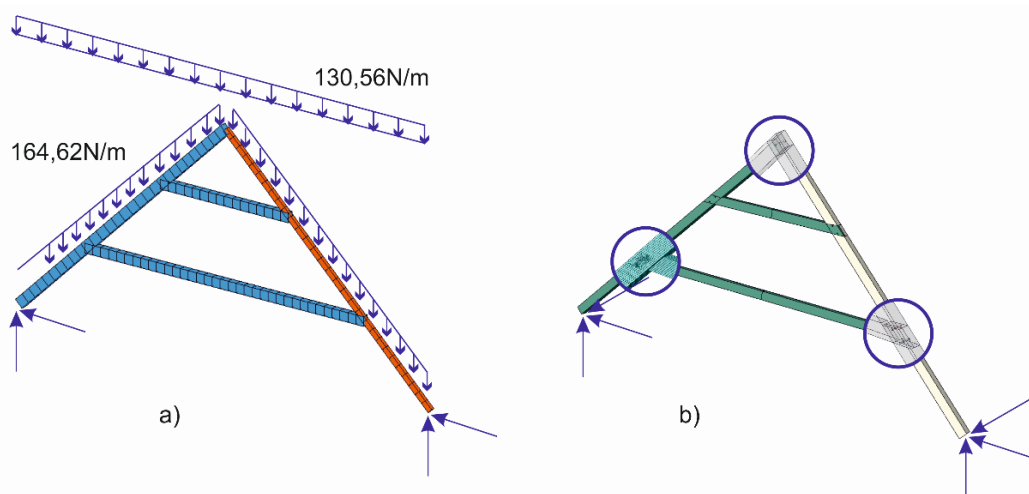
FE models of the roof truss: a) beam, b) solid; loading and boundary conditions
